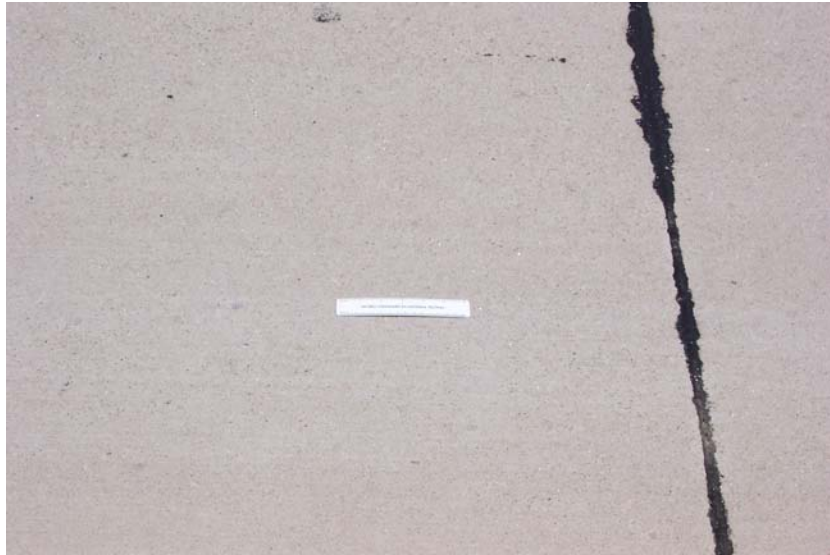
Nall Avenue, south of W 119th Street, Leawood, Kansas
